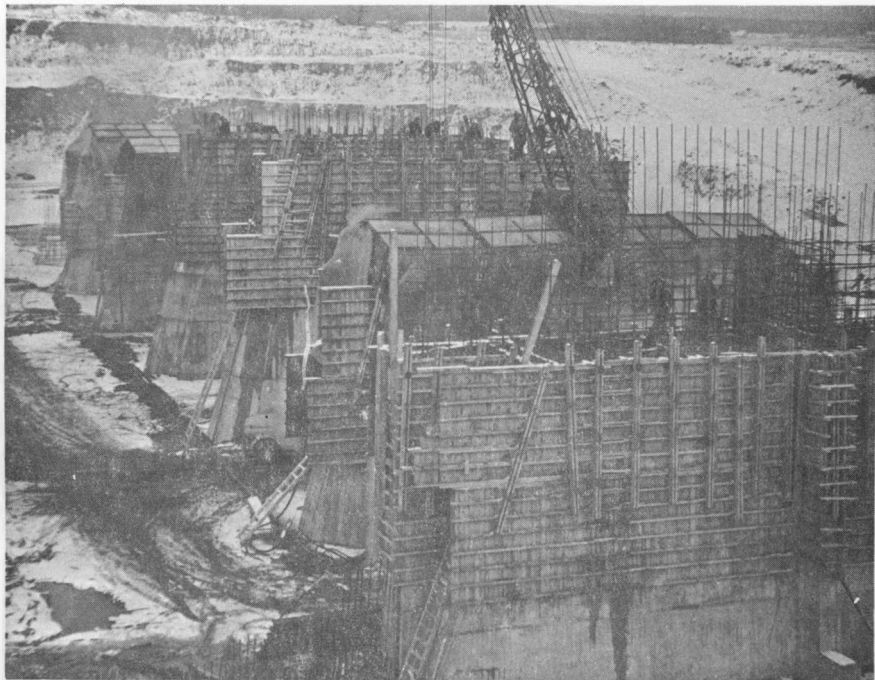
Ground view of the concrete piers seen in Figure 5. The tops of three of the piers are covered to allow steam heating of the curing concrete during the cold weather.
